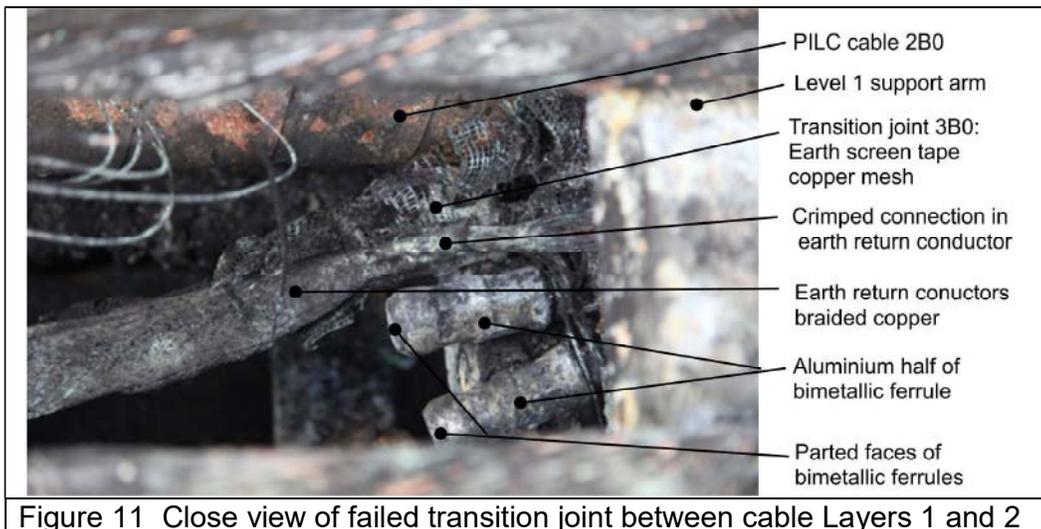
Close view of failed transition joint between cable Layers 1 and 2
